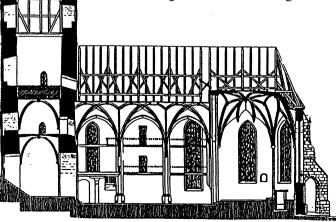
Longitudinal section of the gothic church with baroque tower curia [1]
